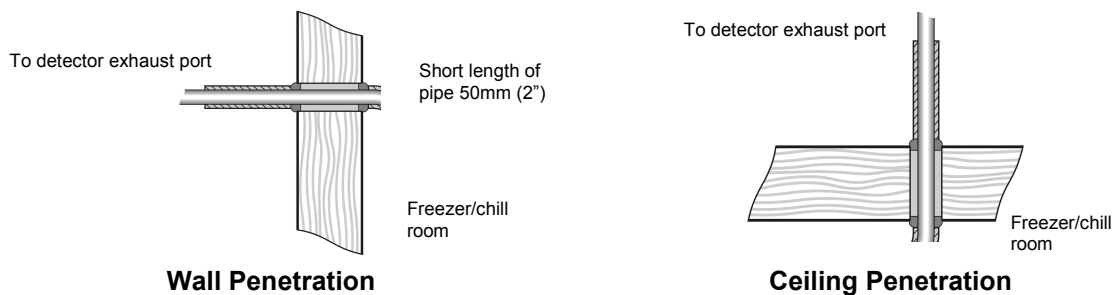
Example of Exhaust Air Fed Back to Protected Zone
